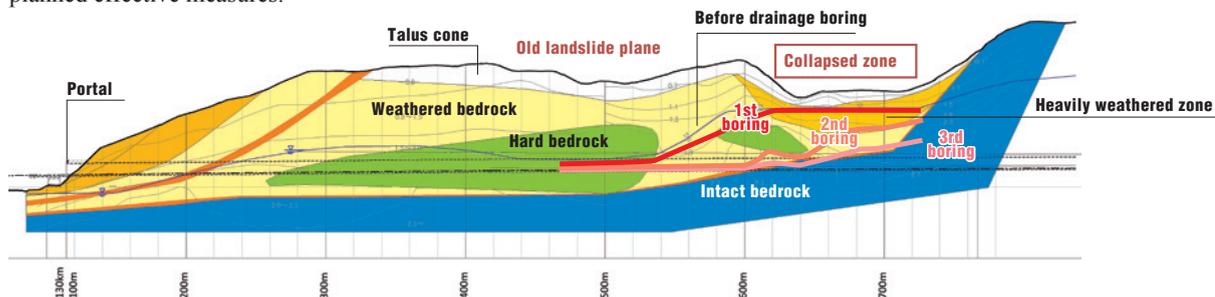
Longitudinal profile of the Shin-Moheji Tunnel
